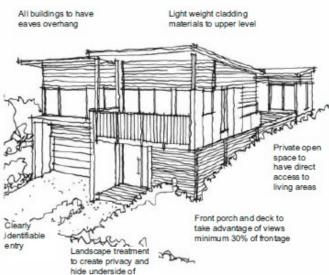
Built Form Code - Building Type F - Single Dwellings
